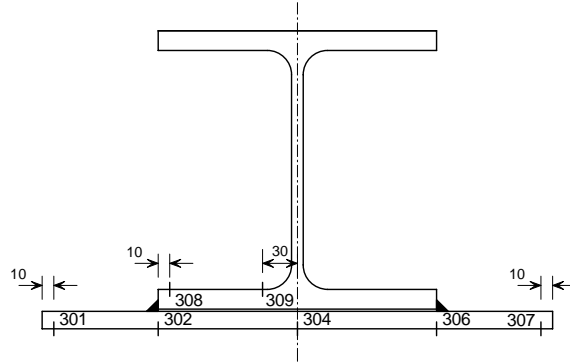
Internal beam transverse arrangement of thermocouples at position B
